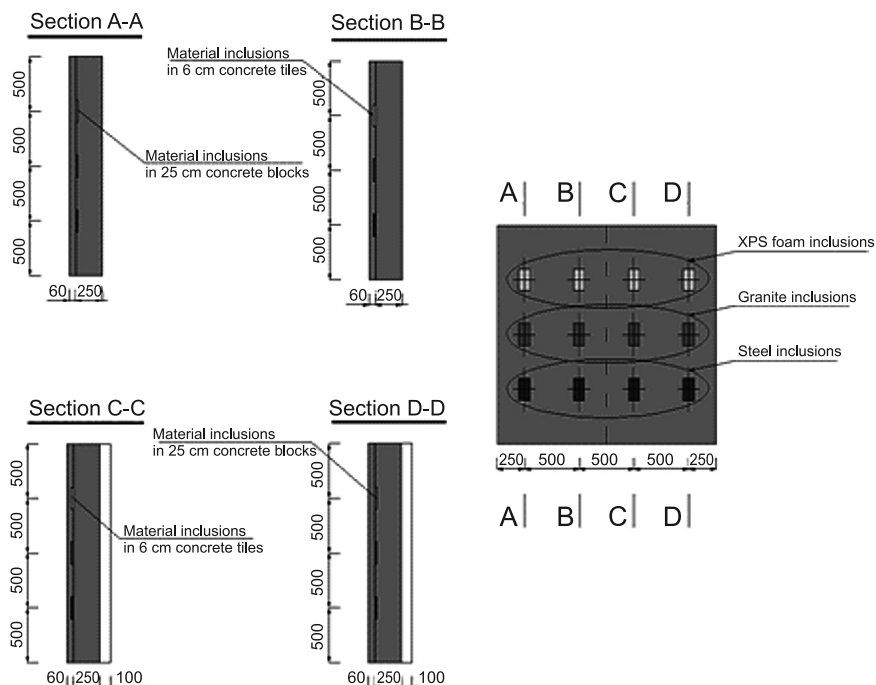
Placement of XPS foam, granite and steel inclusions in wall made of concrete blocks
